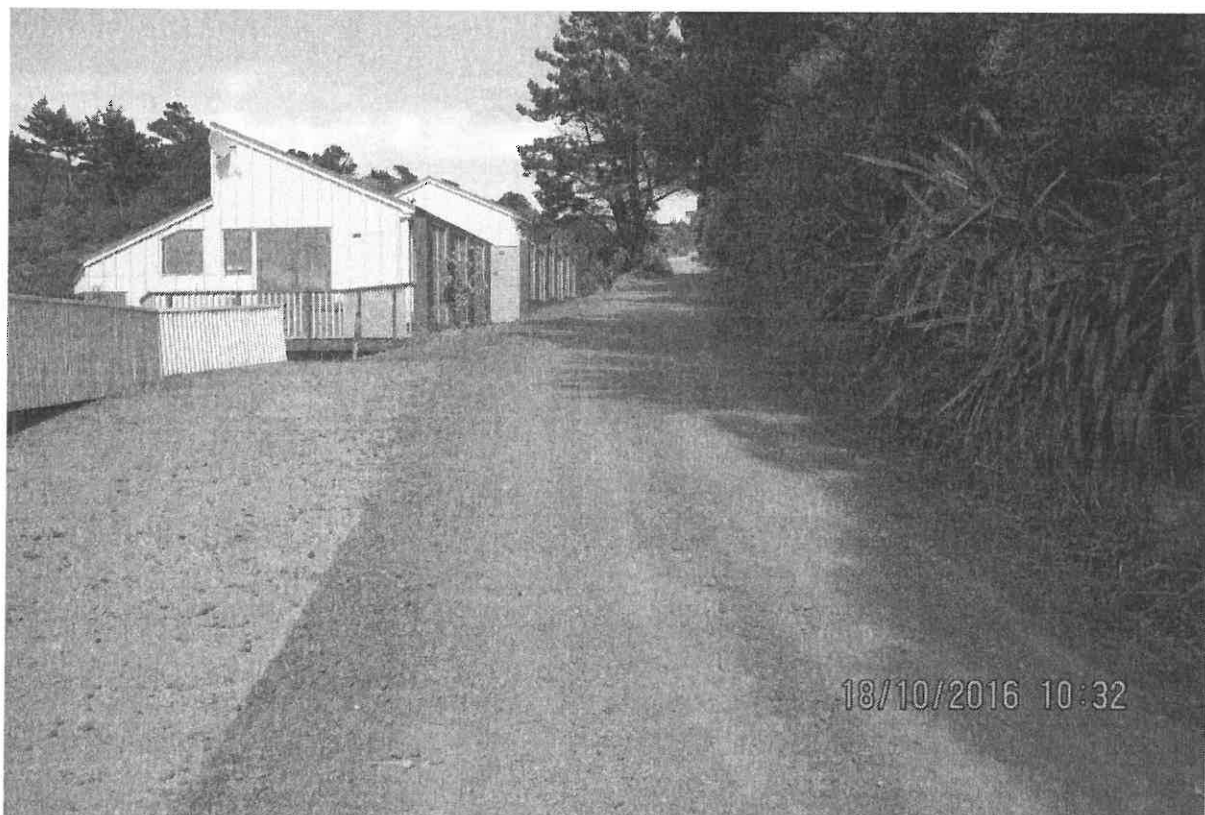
105 Cliffs Road, and a parking area (partially on the right of way) used by one or both of 105 and 107 Cliffs Road. This section of access is to be upgraded by SUB-2013-17 and SUB-2015-96.
